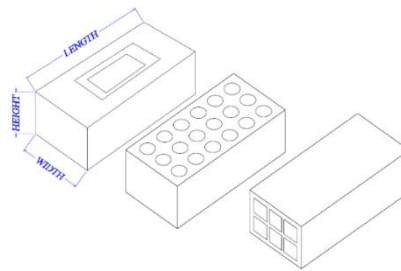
Types of masonry brick units: solid brick, King Kong brick and tubular brick.
